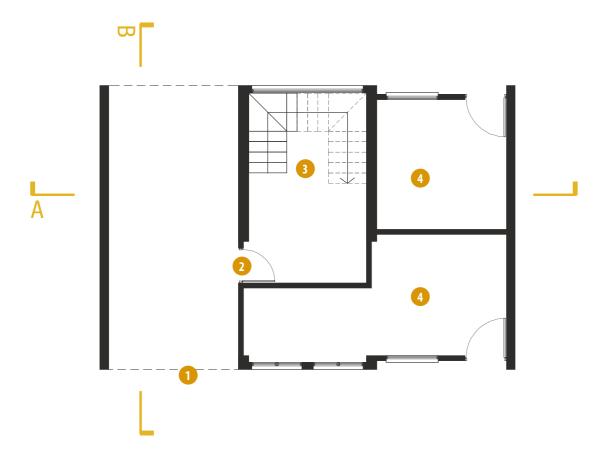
TYPOLOGY H\_GROUND FLOOR PLAN
